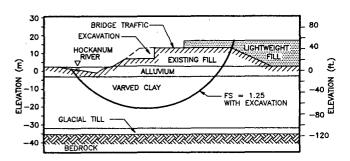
Slope stability for east abutment. Final conditions with lightweight fill.
